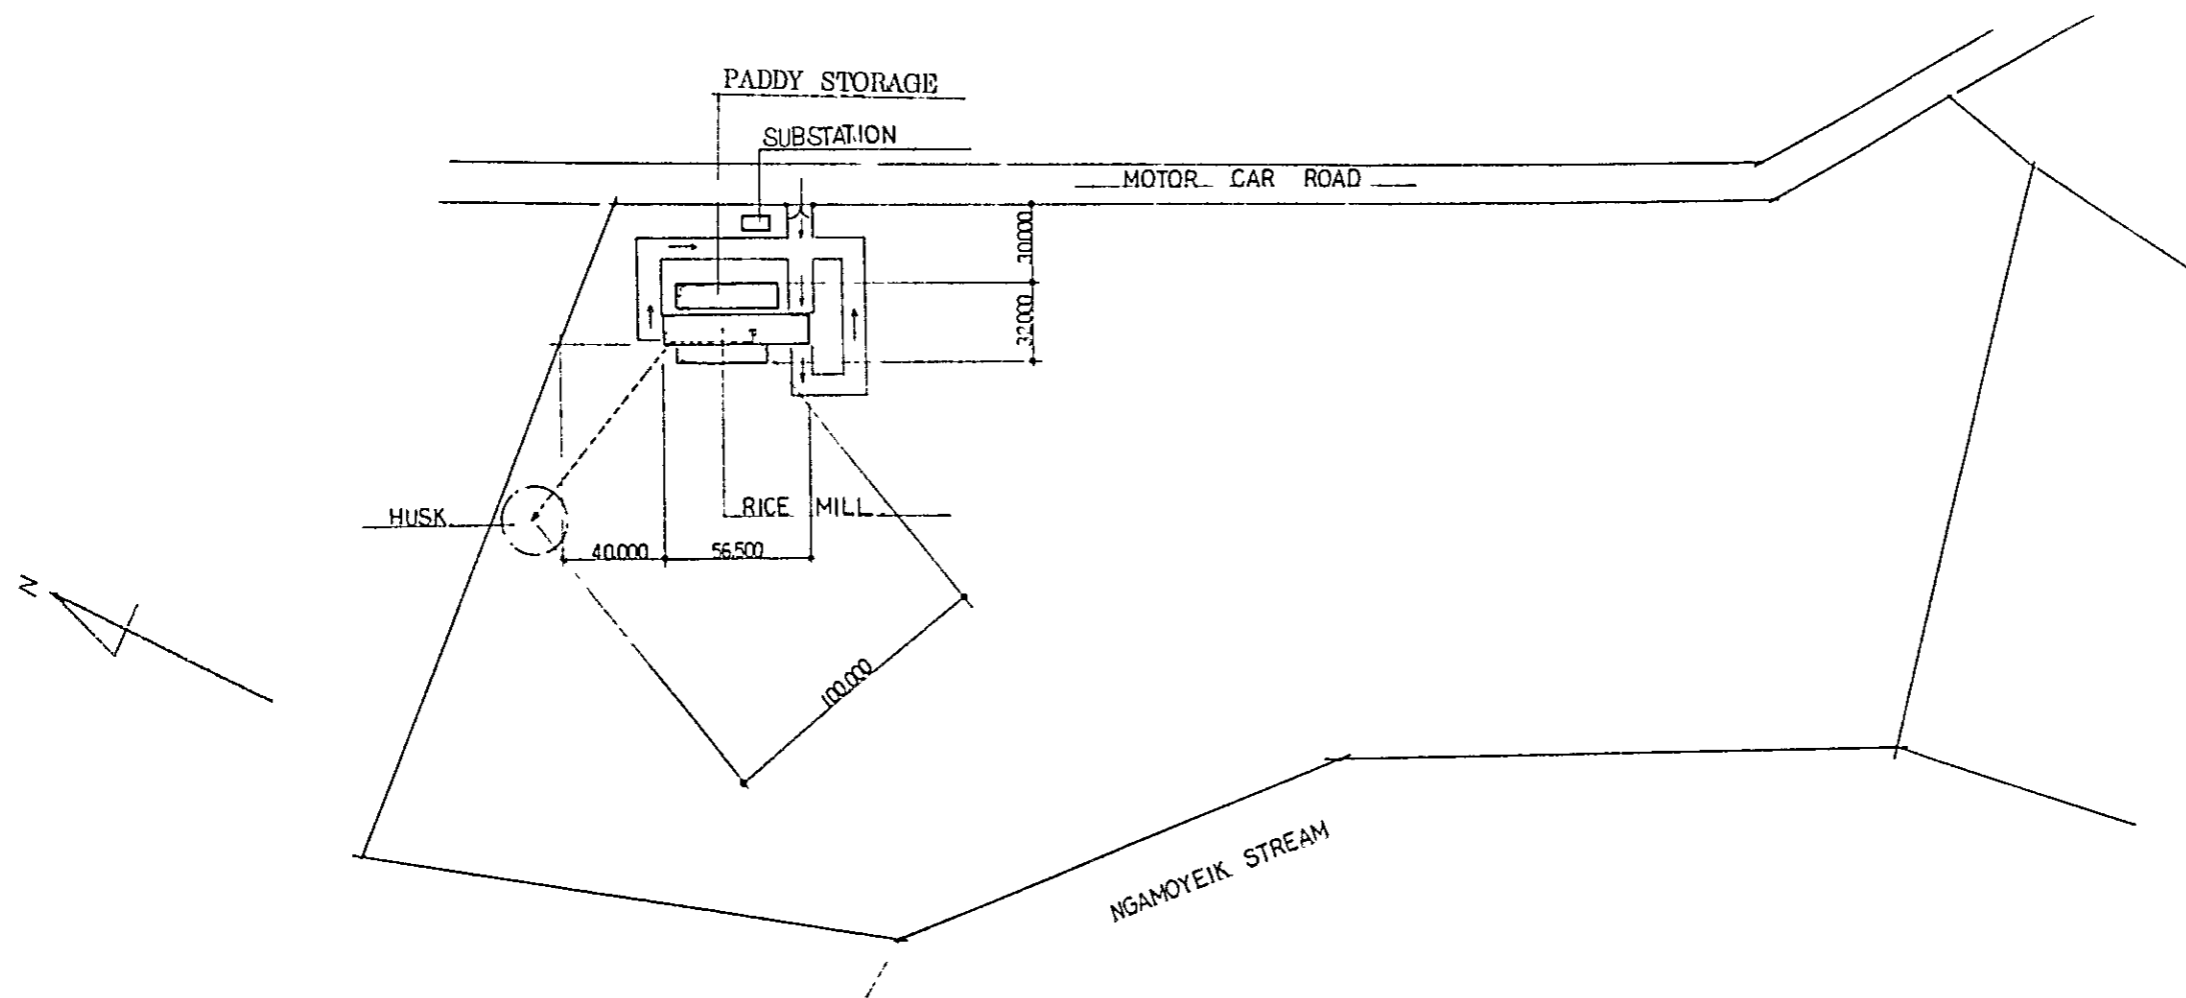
LAYOUT OF RICE MILL PLANT, KANAUNGTOE
